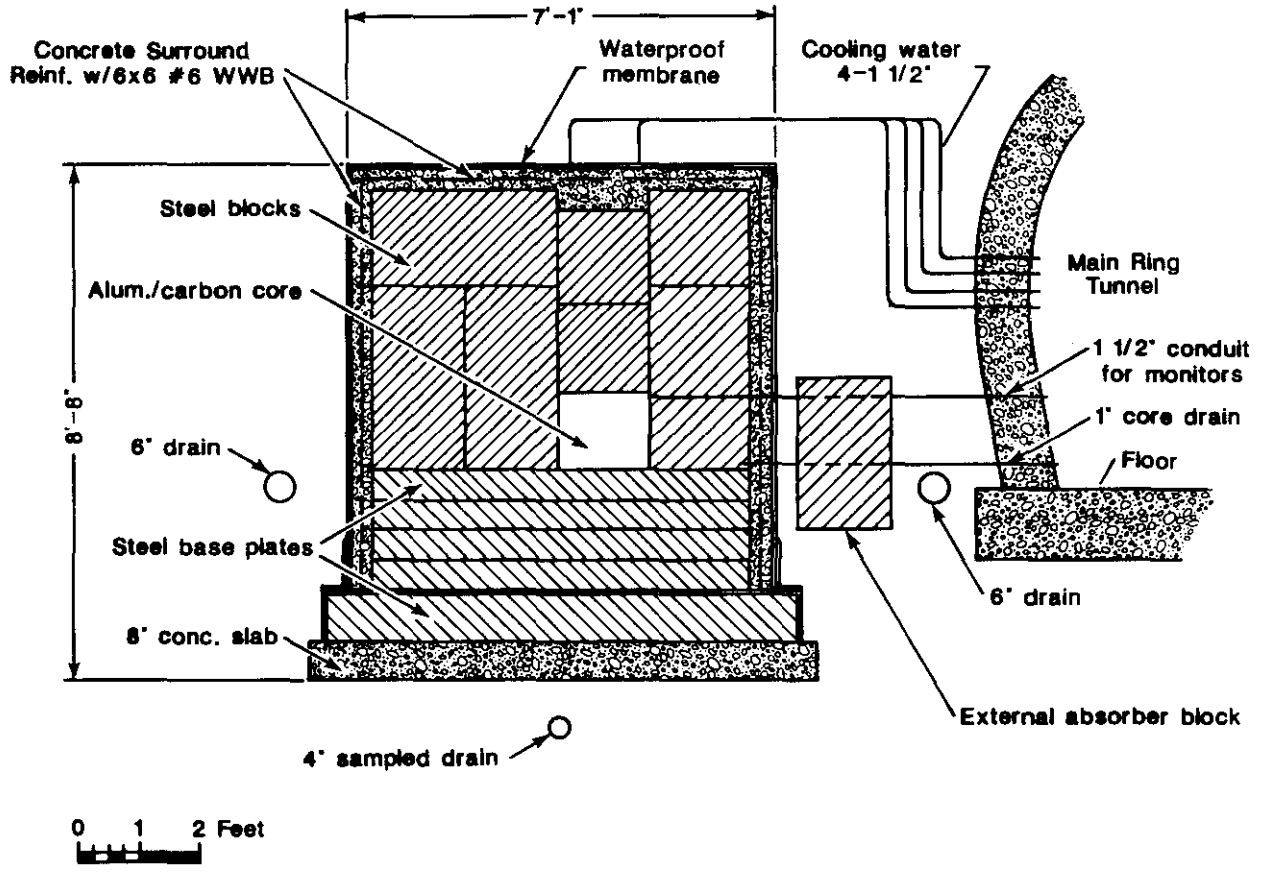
Cross section view of a typical accelerator beam dump; the graphite absorber, aluminum cooling jacket and outer radiation shielding are apparent.
